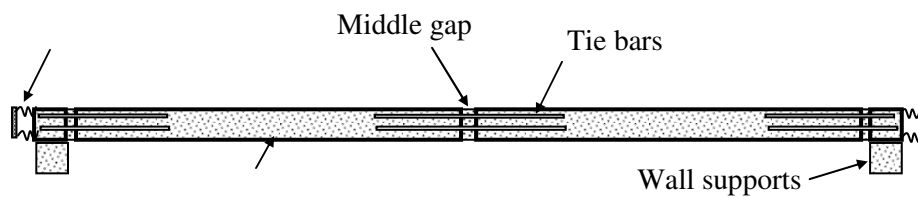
Floor-to-floor joint with top and bottom tie bars
